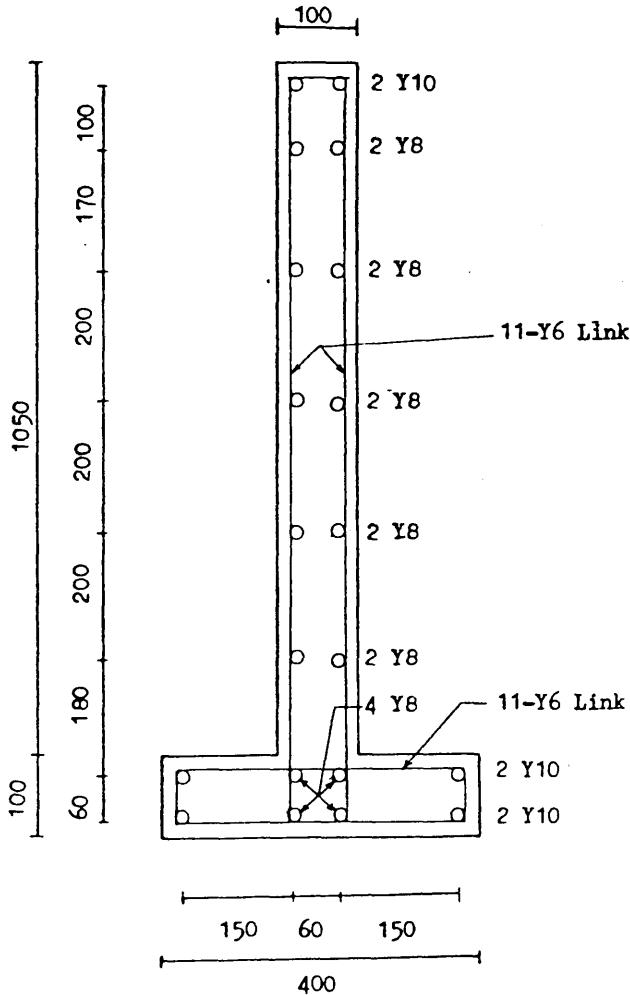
A horizontal section in the wall of model MS12 showing the reinforcing details
